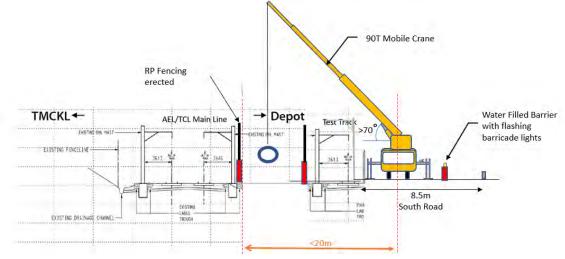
Lifting Section Layout at W2 (For closed Test Track from GLA1 to GL45)
